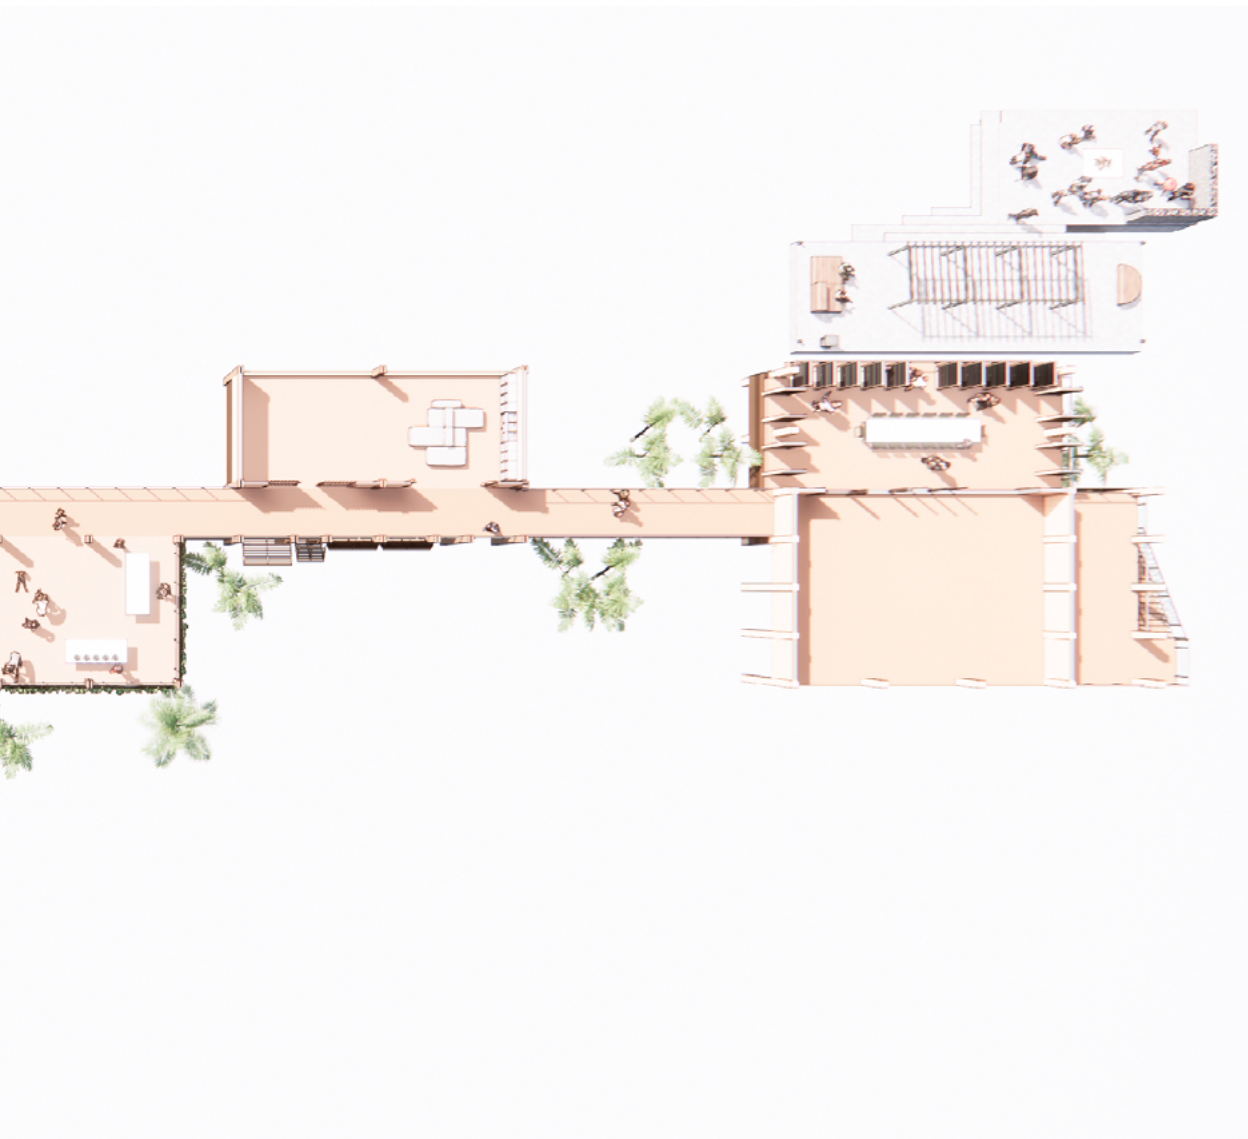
[MULTI UNIT UPPER FLOOR PLAN]
